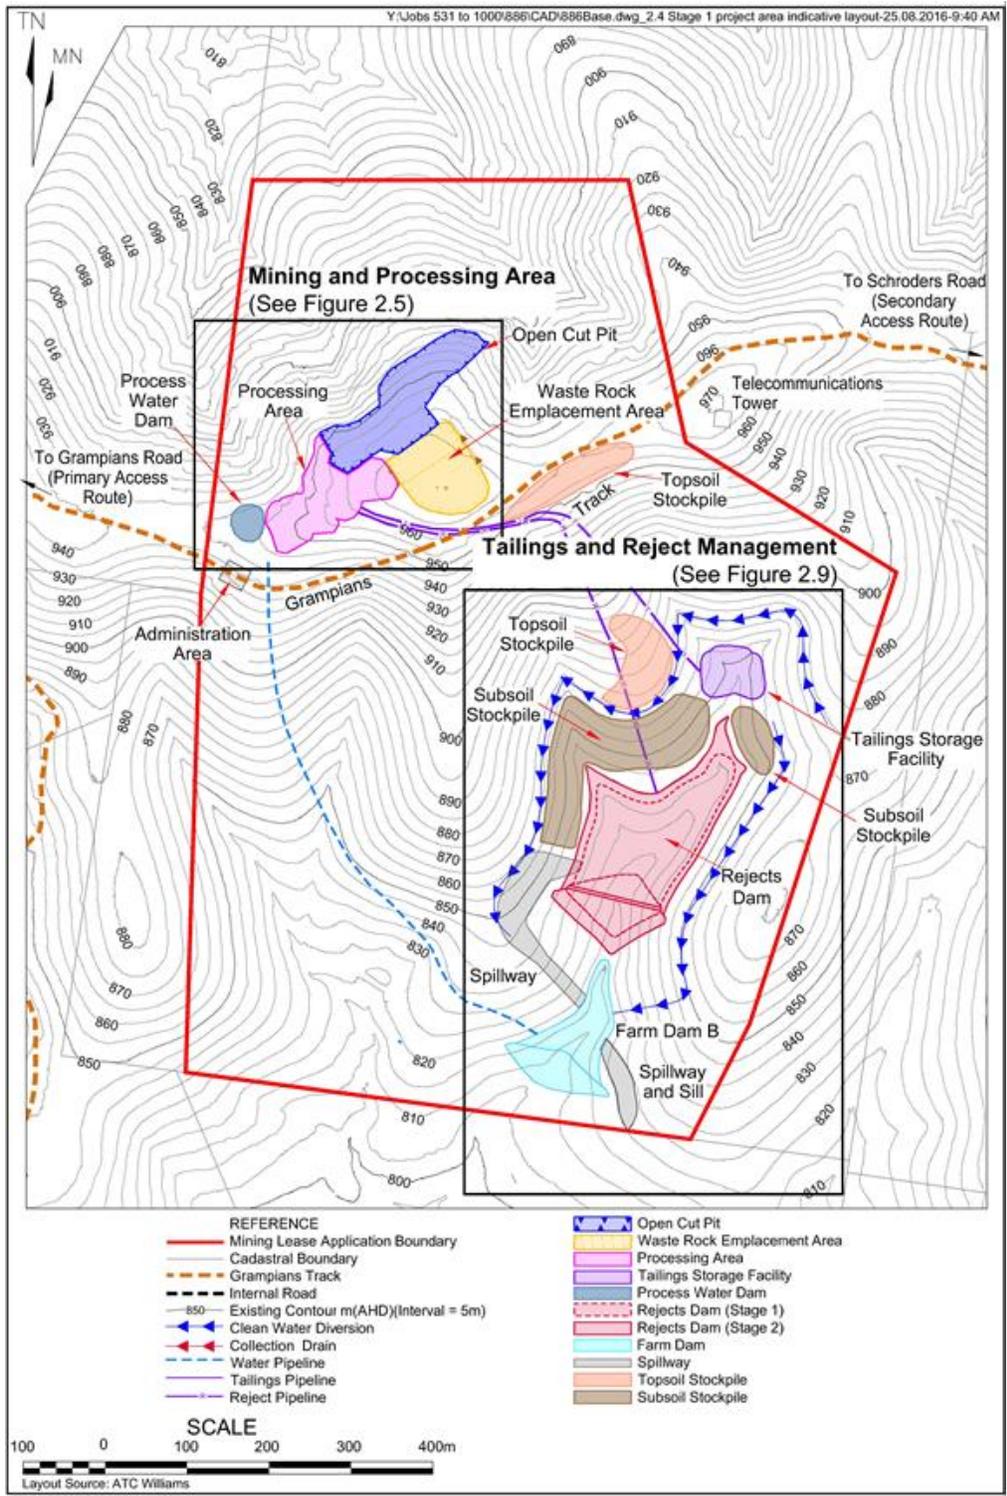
Taronga Stage 1 Proposed Site Layout (Source: ANW)
